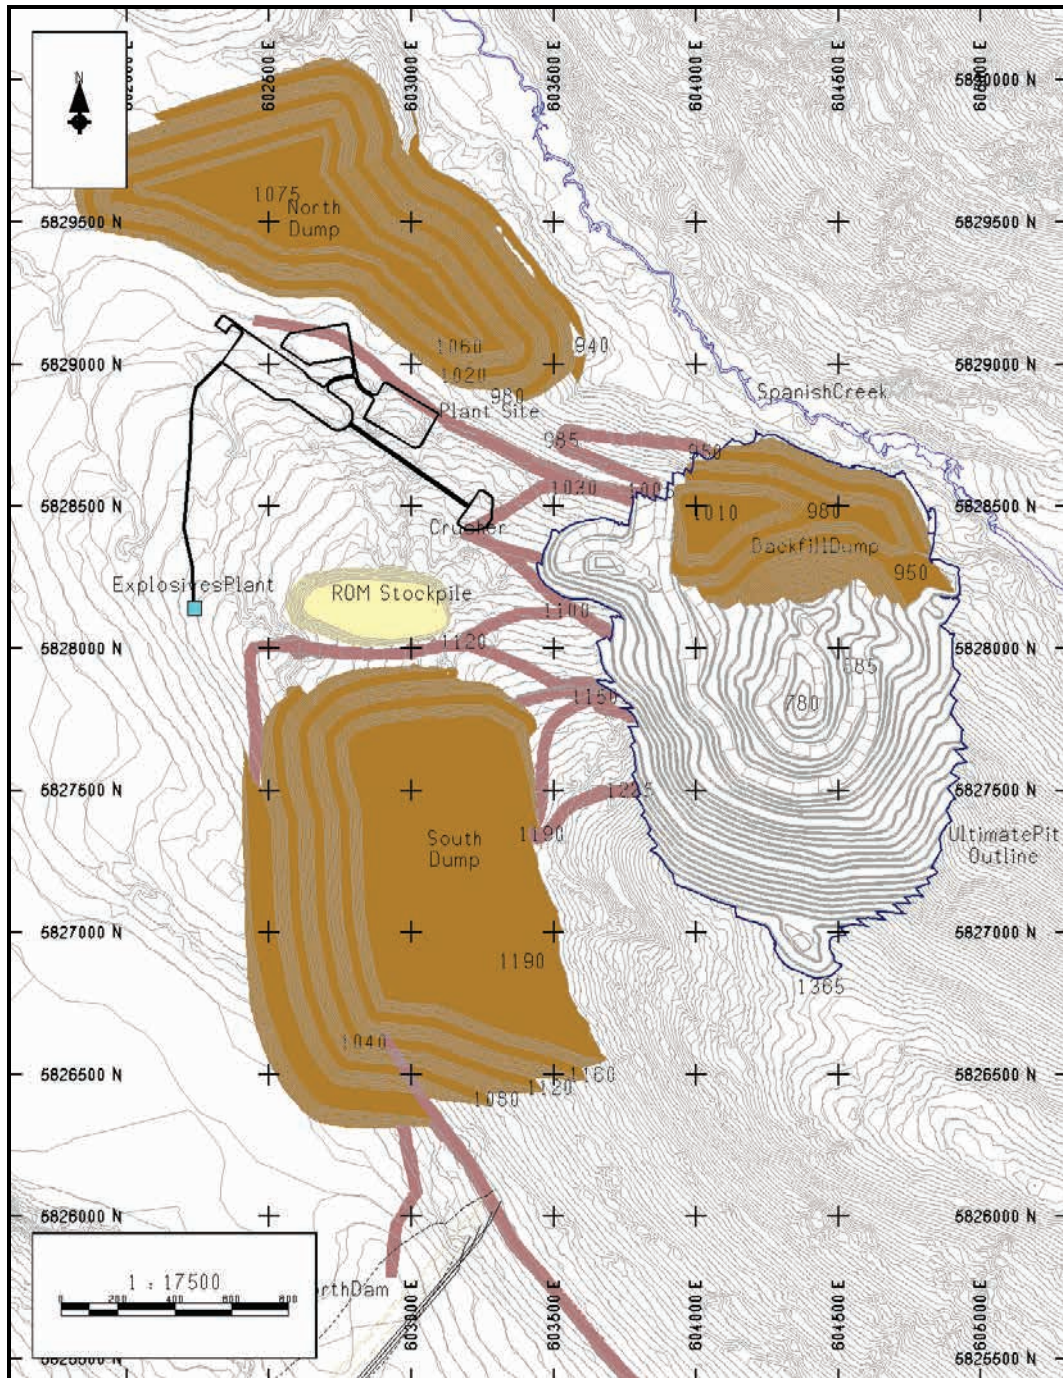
Mine Plan – Year 14 (End of Pit Life)
